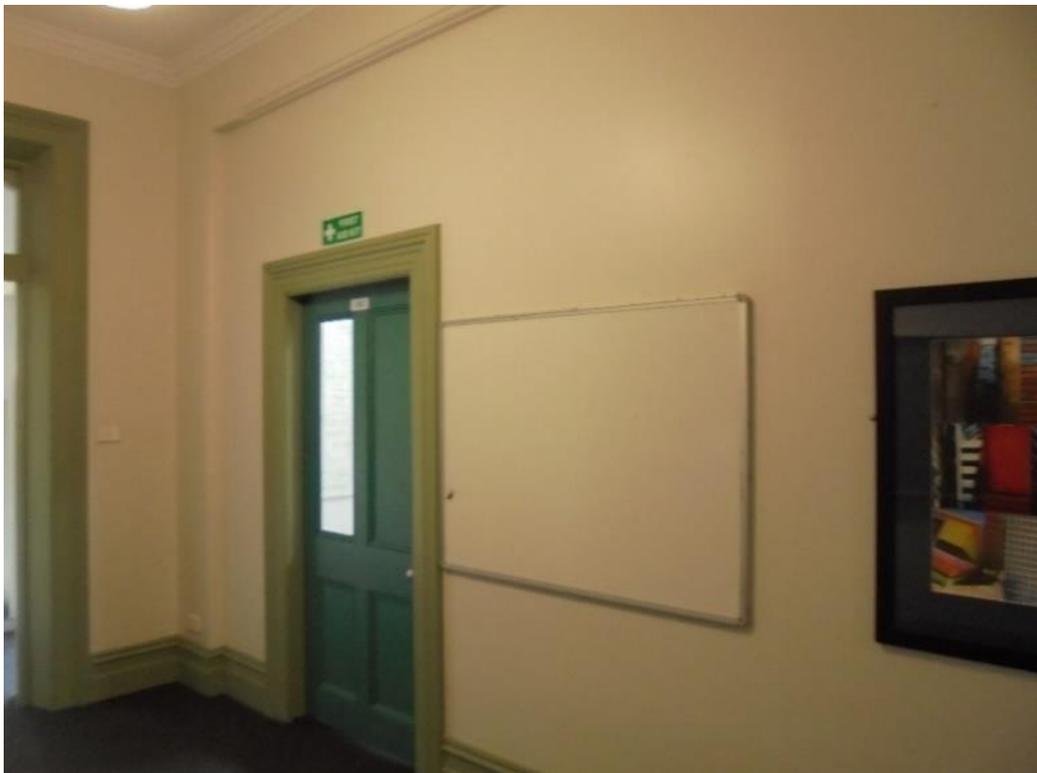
Partial view of the first-floor corridor west wall showing the infill stud wall to be removed as part of the Stage 1 Works, November 2017.
